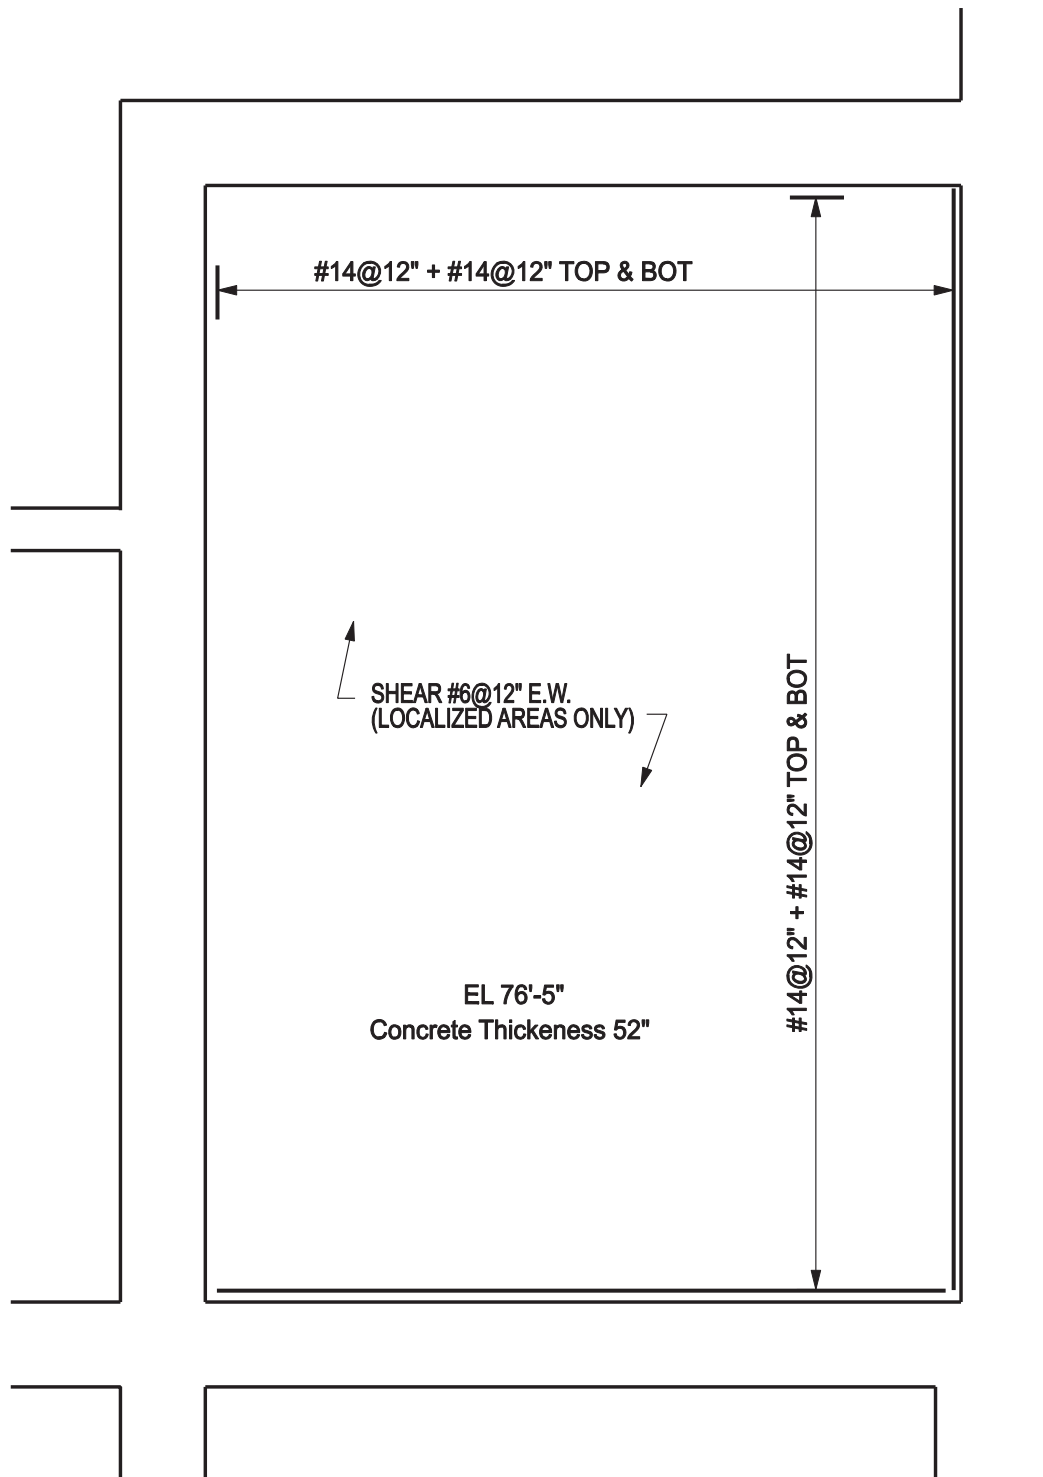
Typical Reinforcement in Emergency Feedwater Pit Slab –
